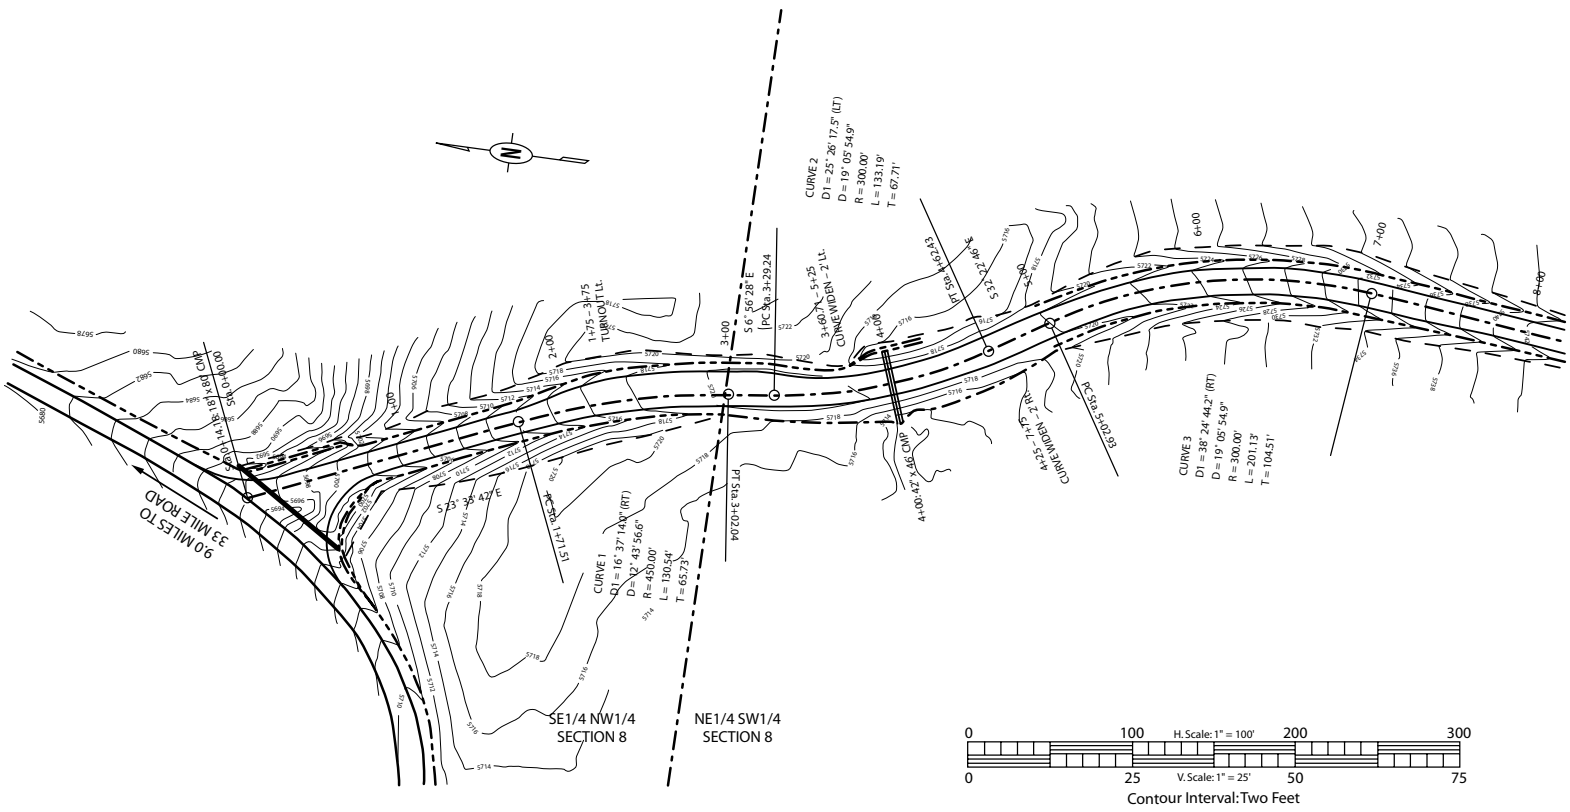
Typical road plan and profile drawing for an oil and gas road.
